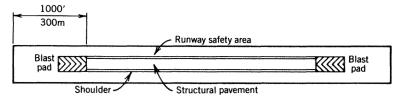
Plan view of runway elements. (Source: Reference 4)
